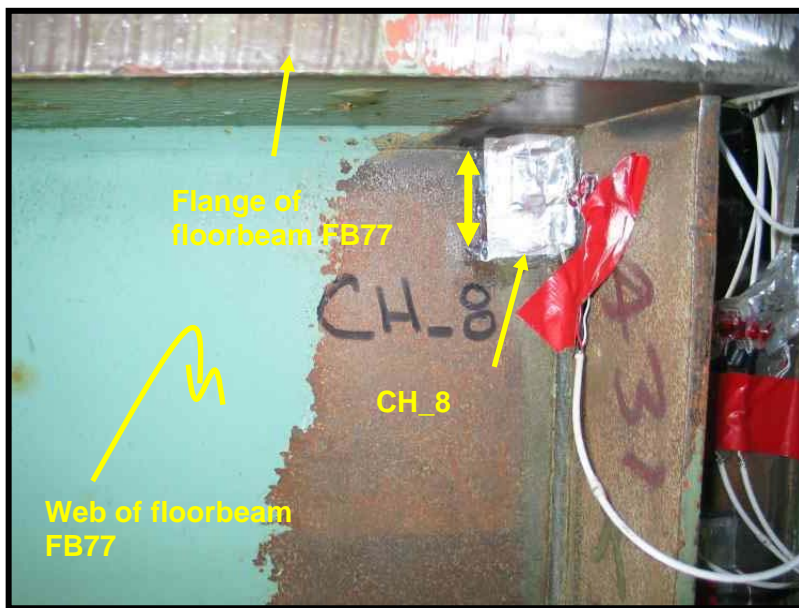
CH_8 installed on the web of floorbeam FB77 at the web gap (View looking south)
